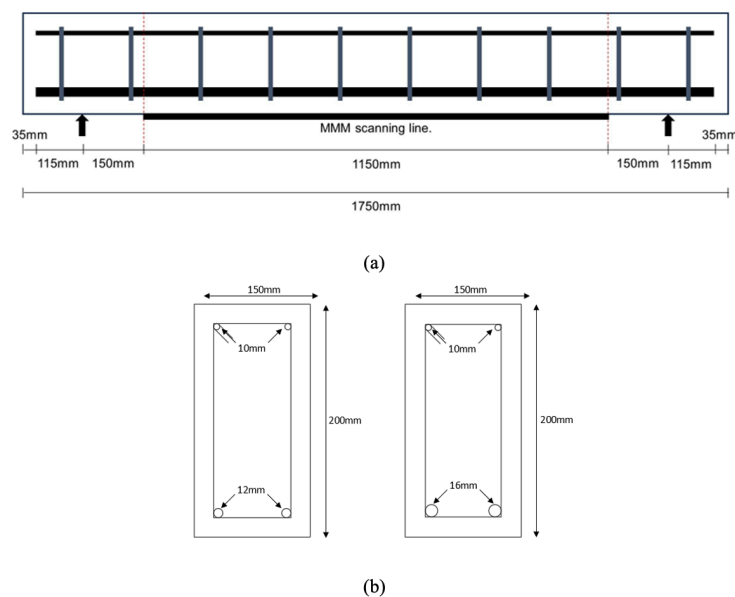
Reinforcement used for this study a) side view of the RC beam with detail of the scanning line b) cross sections of the beam
